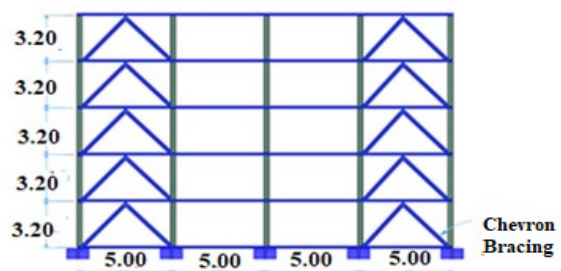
Elevation view of 5-story steel base-isolated structure.
